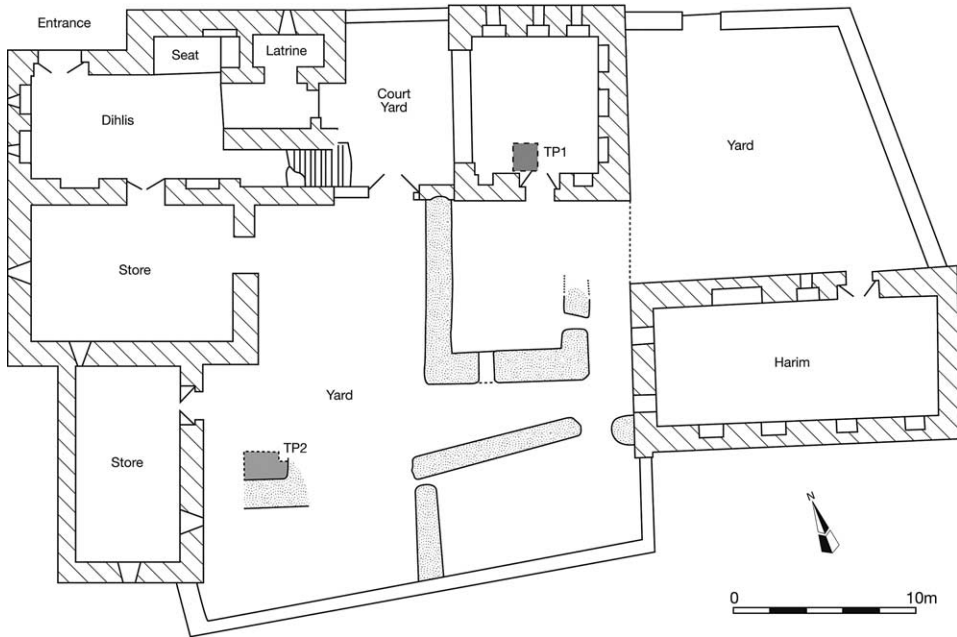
Suakin: ground floor plan of the building known as the Beit el Basha.
